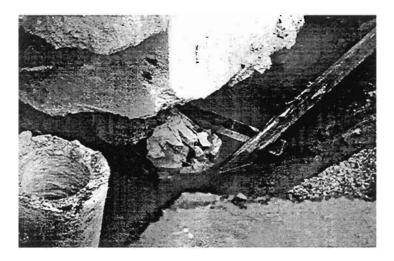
Damaged reinforced concrete piles found at Minatojima, Port Island
